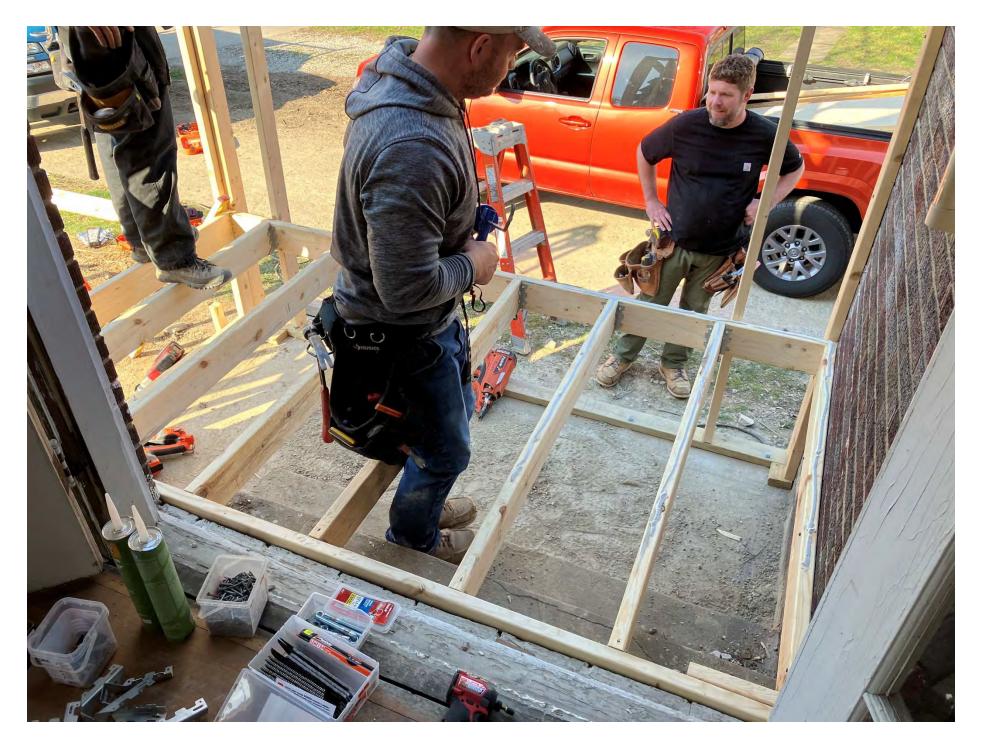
Greenhouse removed and original slab on concrete block on concrete footer exposed
